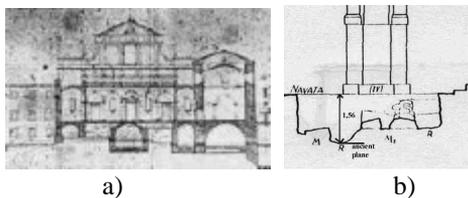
Reconstruction design for the Basilica in Montecassino Abbey: a) an overall cross-section, [17]; b) a cross section between the ancient and current pavements.
